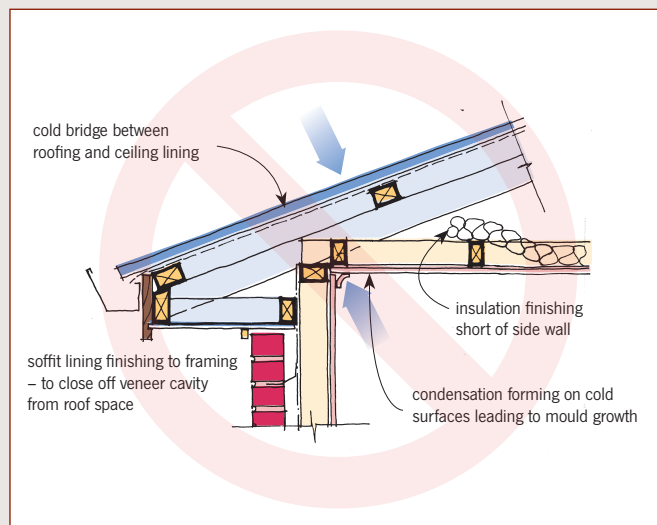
The cause of mould on the walls and ceiling – lack of insulation.
